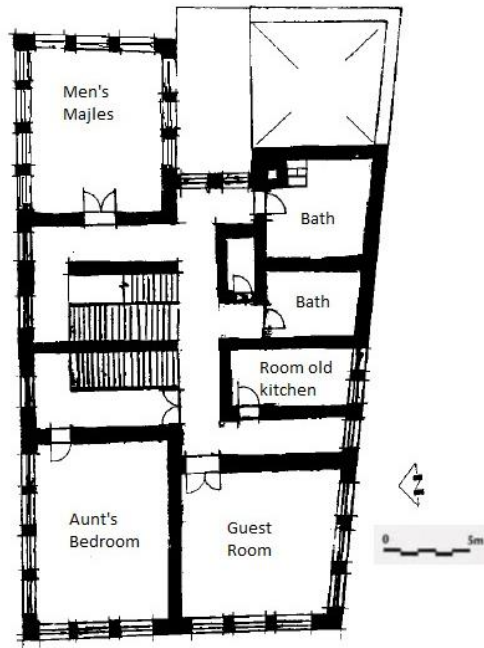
Bamansur House (Second Floor) Mukalla (Al-Maashi, 1998)
